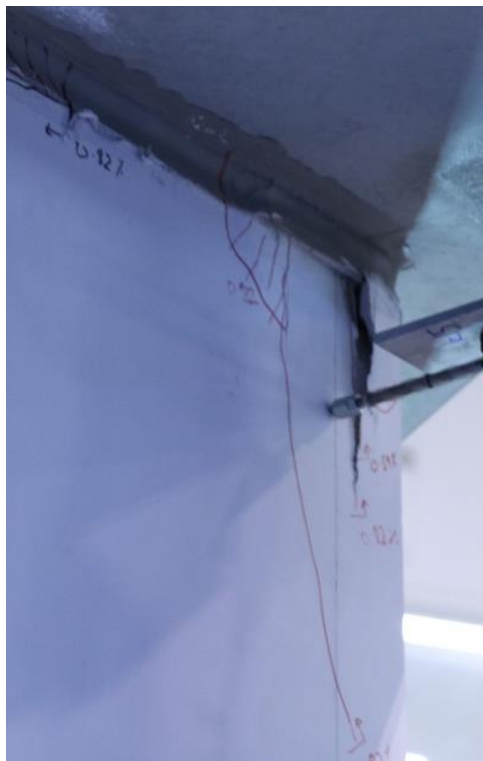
Specimen A2 - Step 10 - DS2: Progression of cracking of wallboard at wall end from pushing from track – location 7
